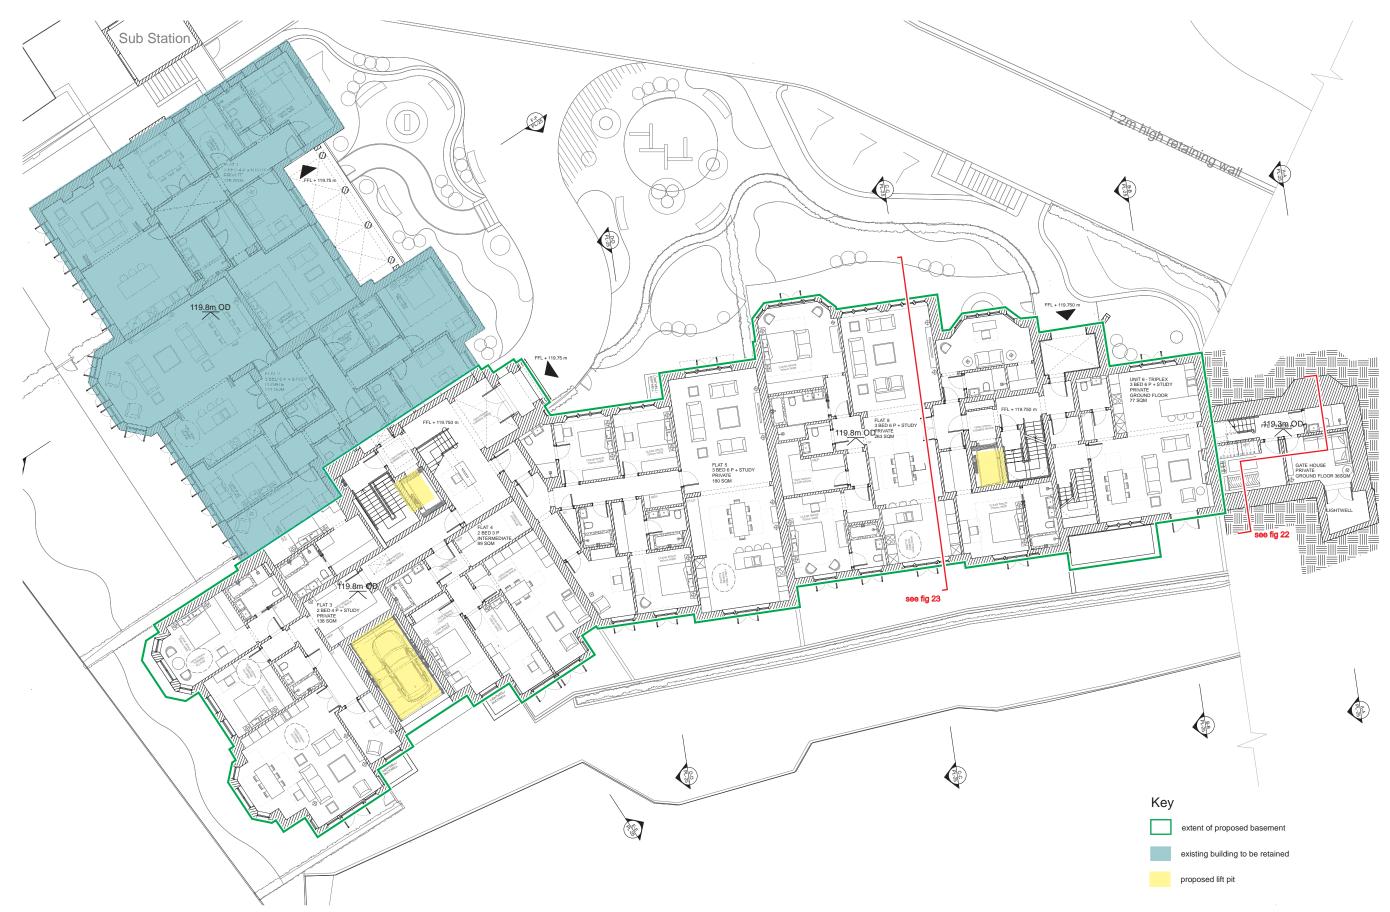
Proposed ground floor plan with proposed floor level (Stanhope Gate Architecture, Proposed Ground Floor Plan, dwg. PL-18 I, 12-2019)
